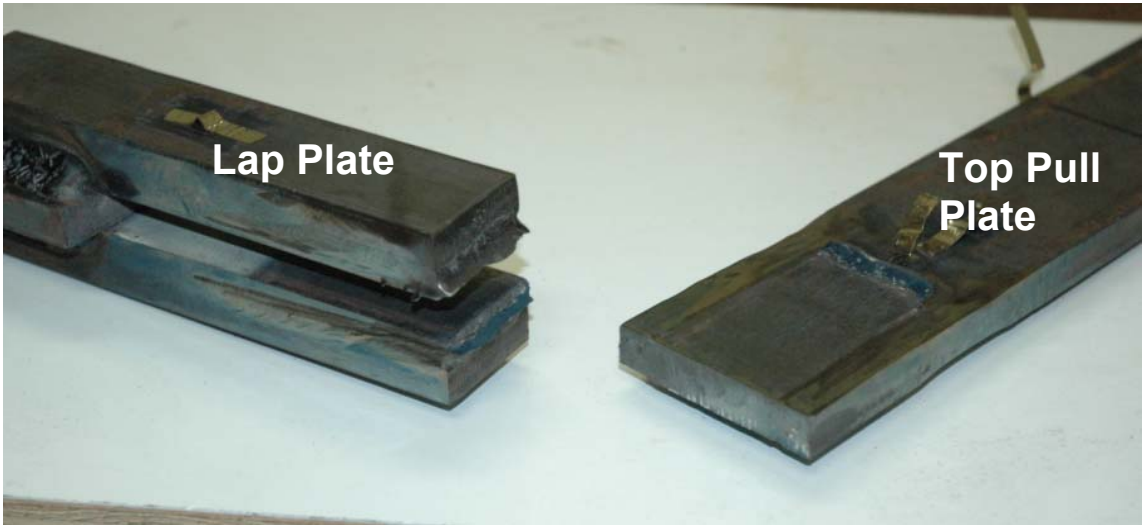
Photograph of Specimen 3 after fracture, where the weld on the lap plate and top base plate is visible
